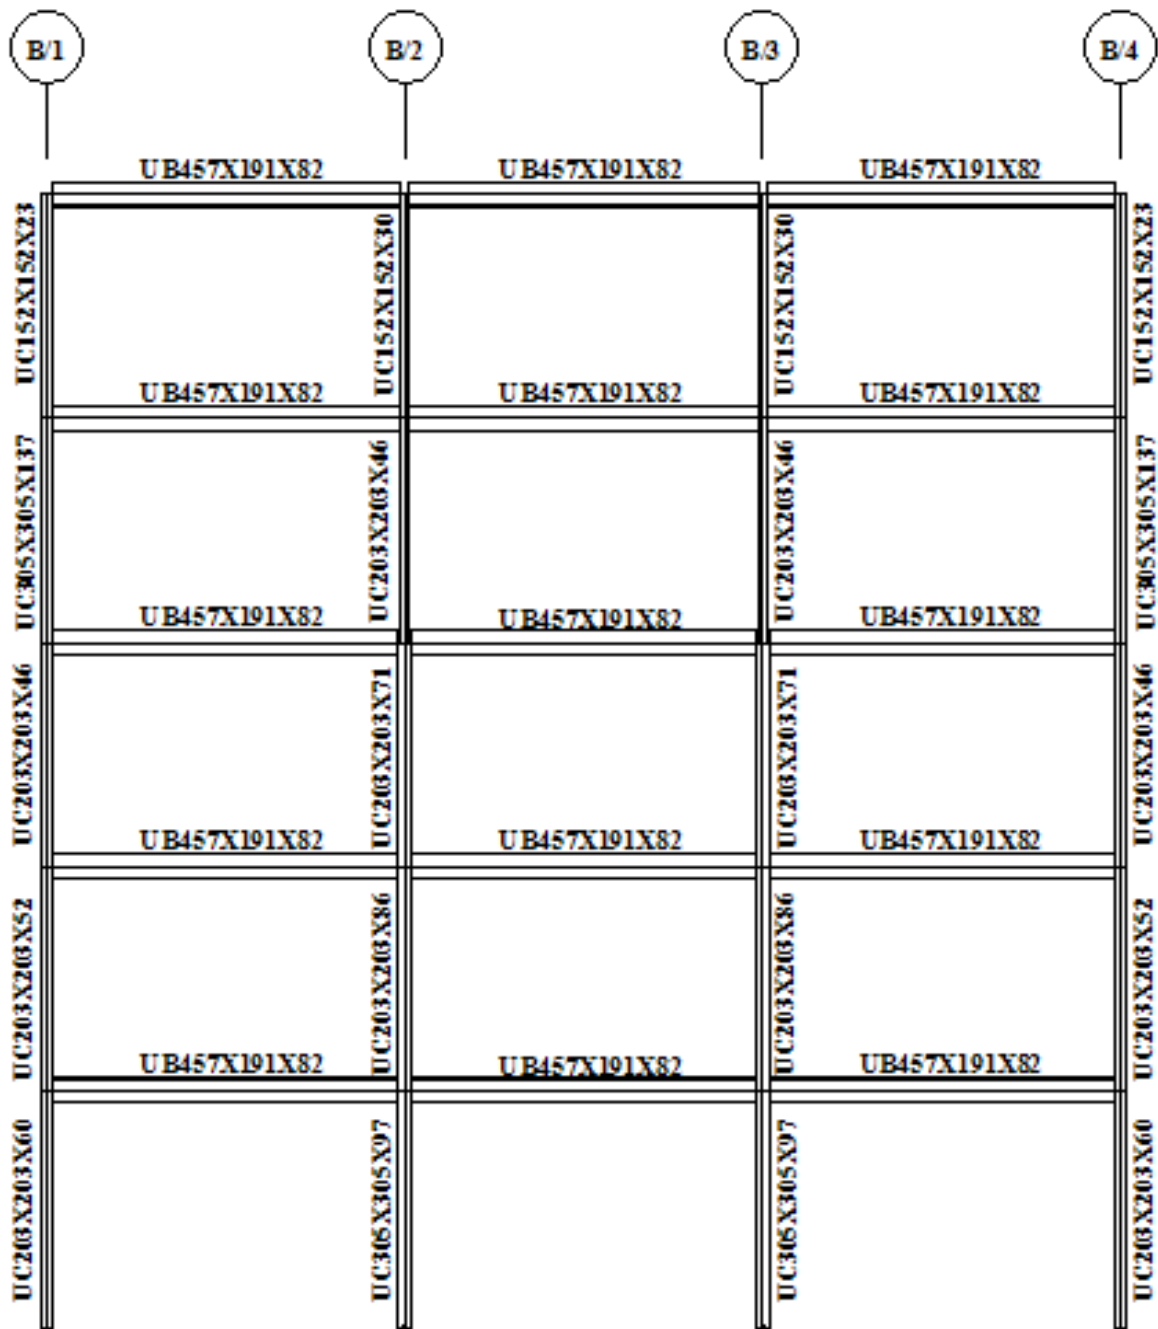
(d): Design result of symmetrical plan and section with RHS brace steel profile, section B_B.
